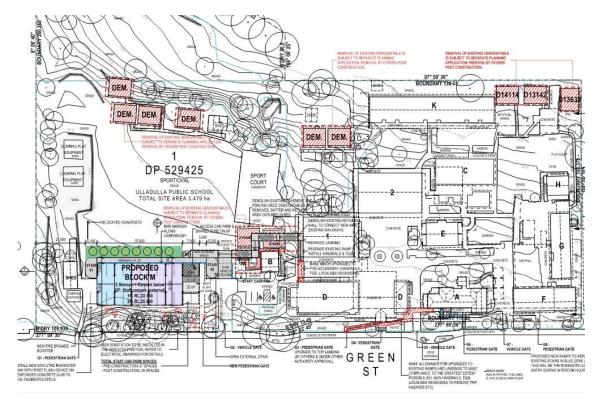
Site Plan (Source: Fulton Trotter, 2025)
